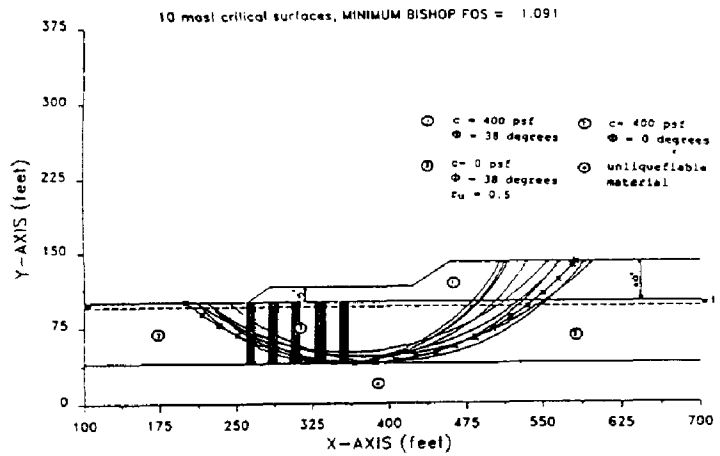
Stability of 40-ft Embankment With Berm And Stone Column Support
